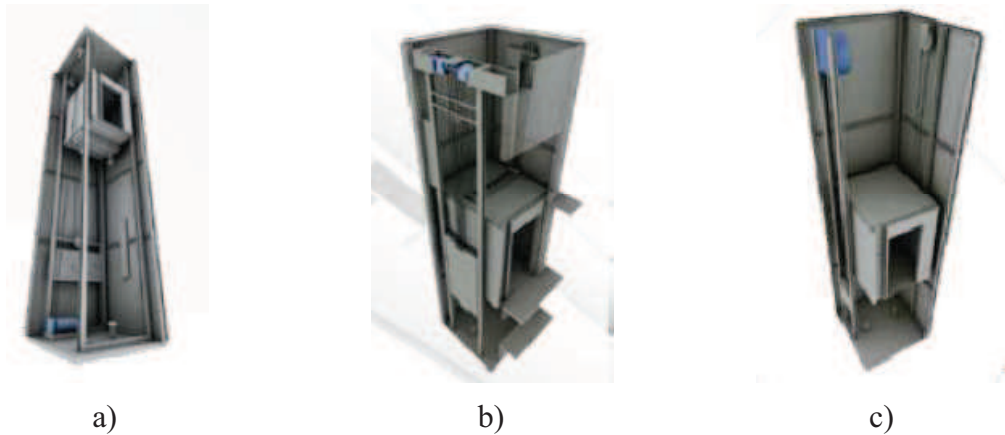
a) Machine on the base, b) machine on the top, and c) machine integrated in the rails [Figures by Kone]
